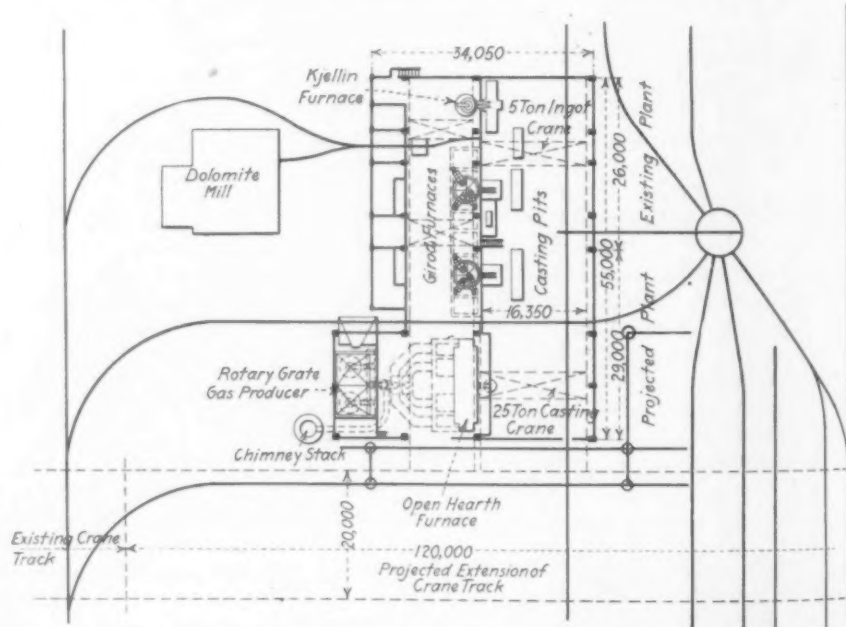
Plan of the Baildonhütte Electric Steel Plant
